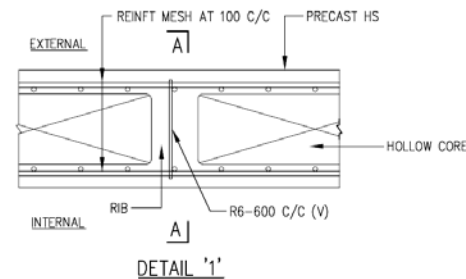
REINFORCEMENT BAR DETAILS OF WALL AND RIB FOR PRECAST HS (TYPE 1)
